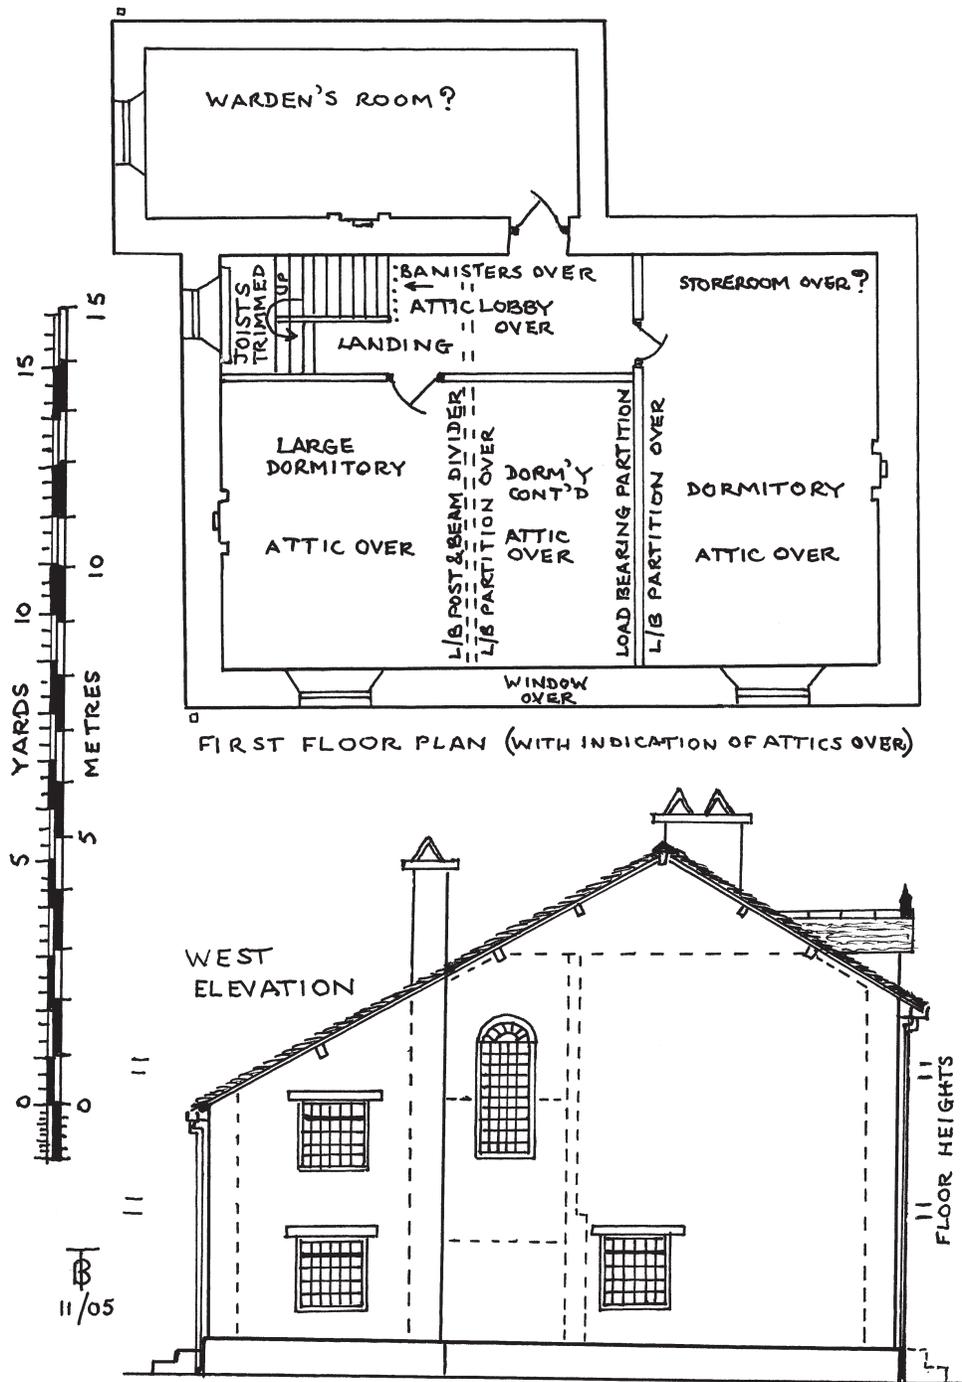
Reconstructions of the layout and appearance of Undermillbeck Workhouse based on the Ordnance Survey plan (1858), details in the carpenter's contract and building accounts and on structural considerations.
